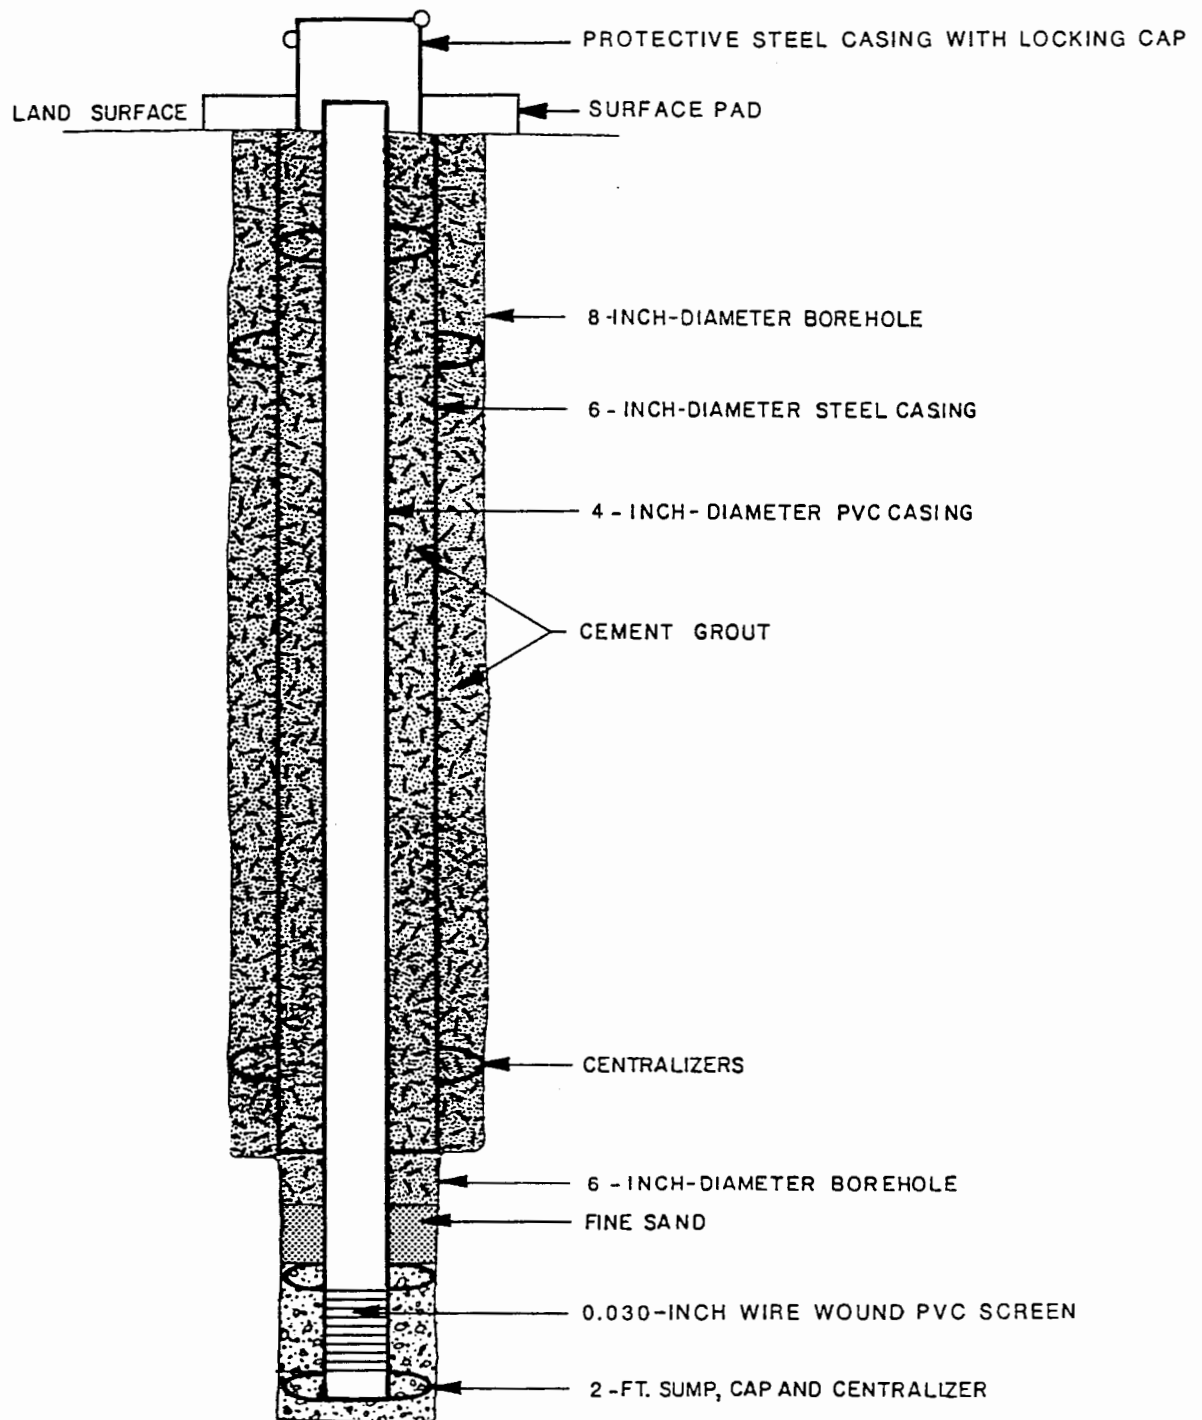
Construction Diagram of Telescoping Well Design.
